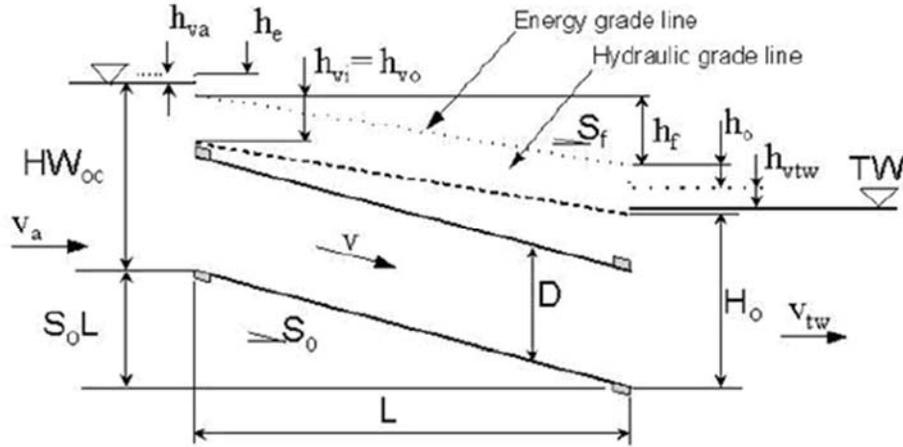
Outlet Control, Fully Submerged Flow
